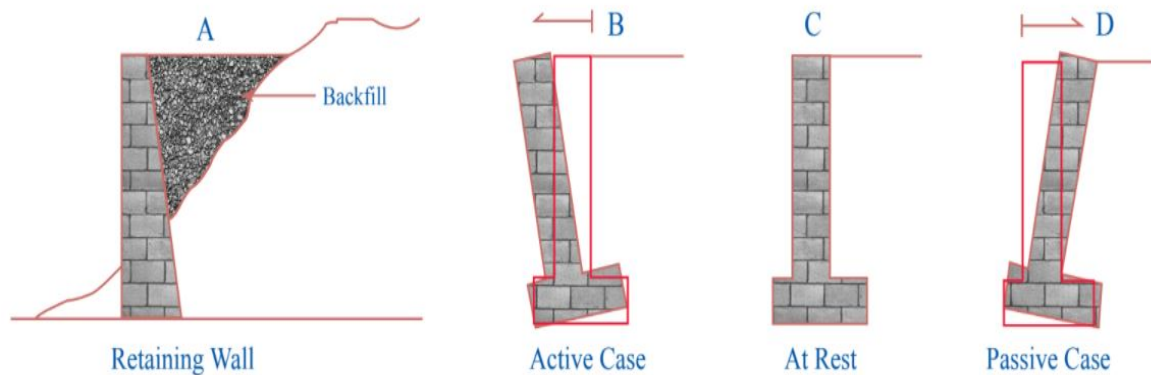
A: Retaining wall supporting the backfill, B: Active case where wall moves away from the backfill, C: The wall is at rest and the back fill in the natural state, D: Passive case where wall moves towards the backfill.
